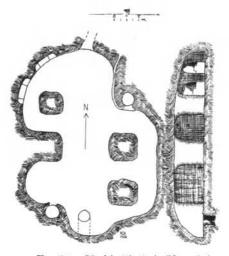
Keskin Sivrissi. Plan of the second floor.
